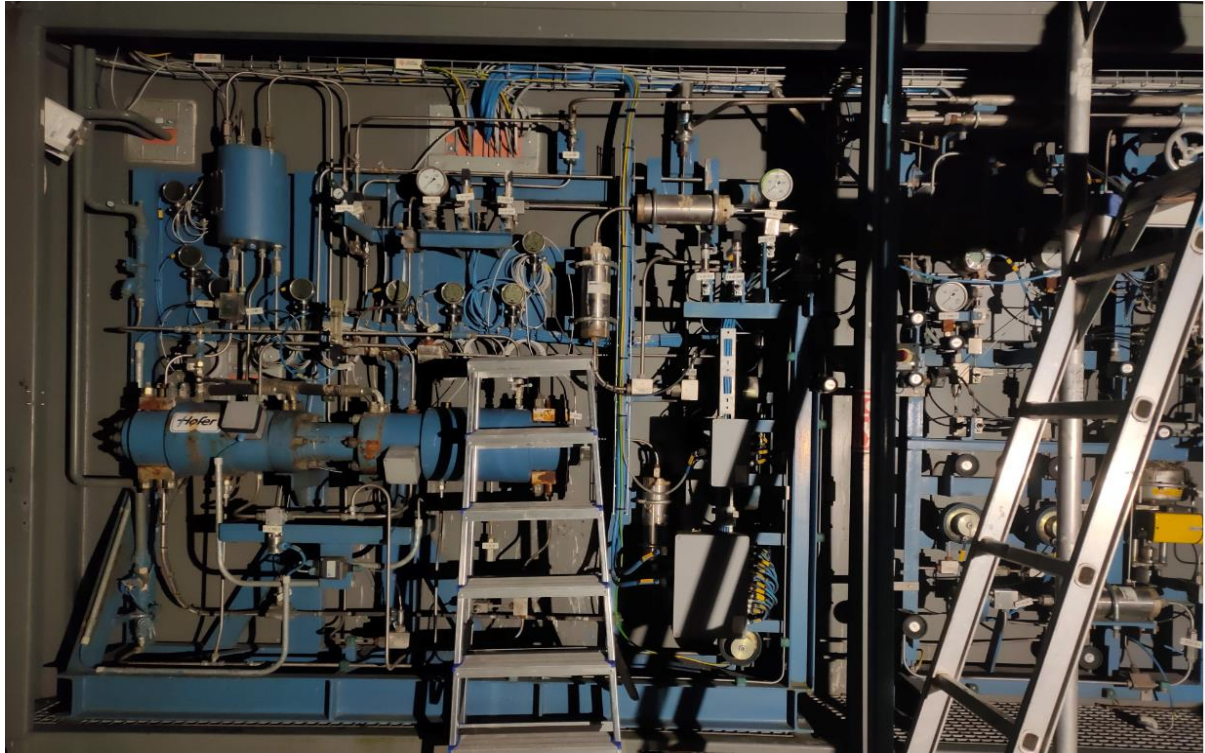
A section of Hydrogen Refuelling unit during installation at Djupvik site.
